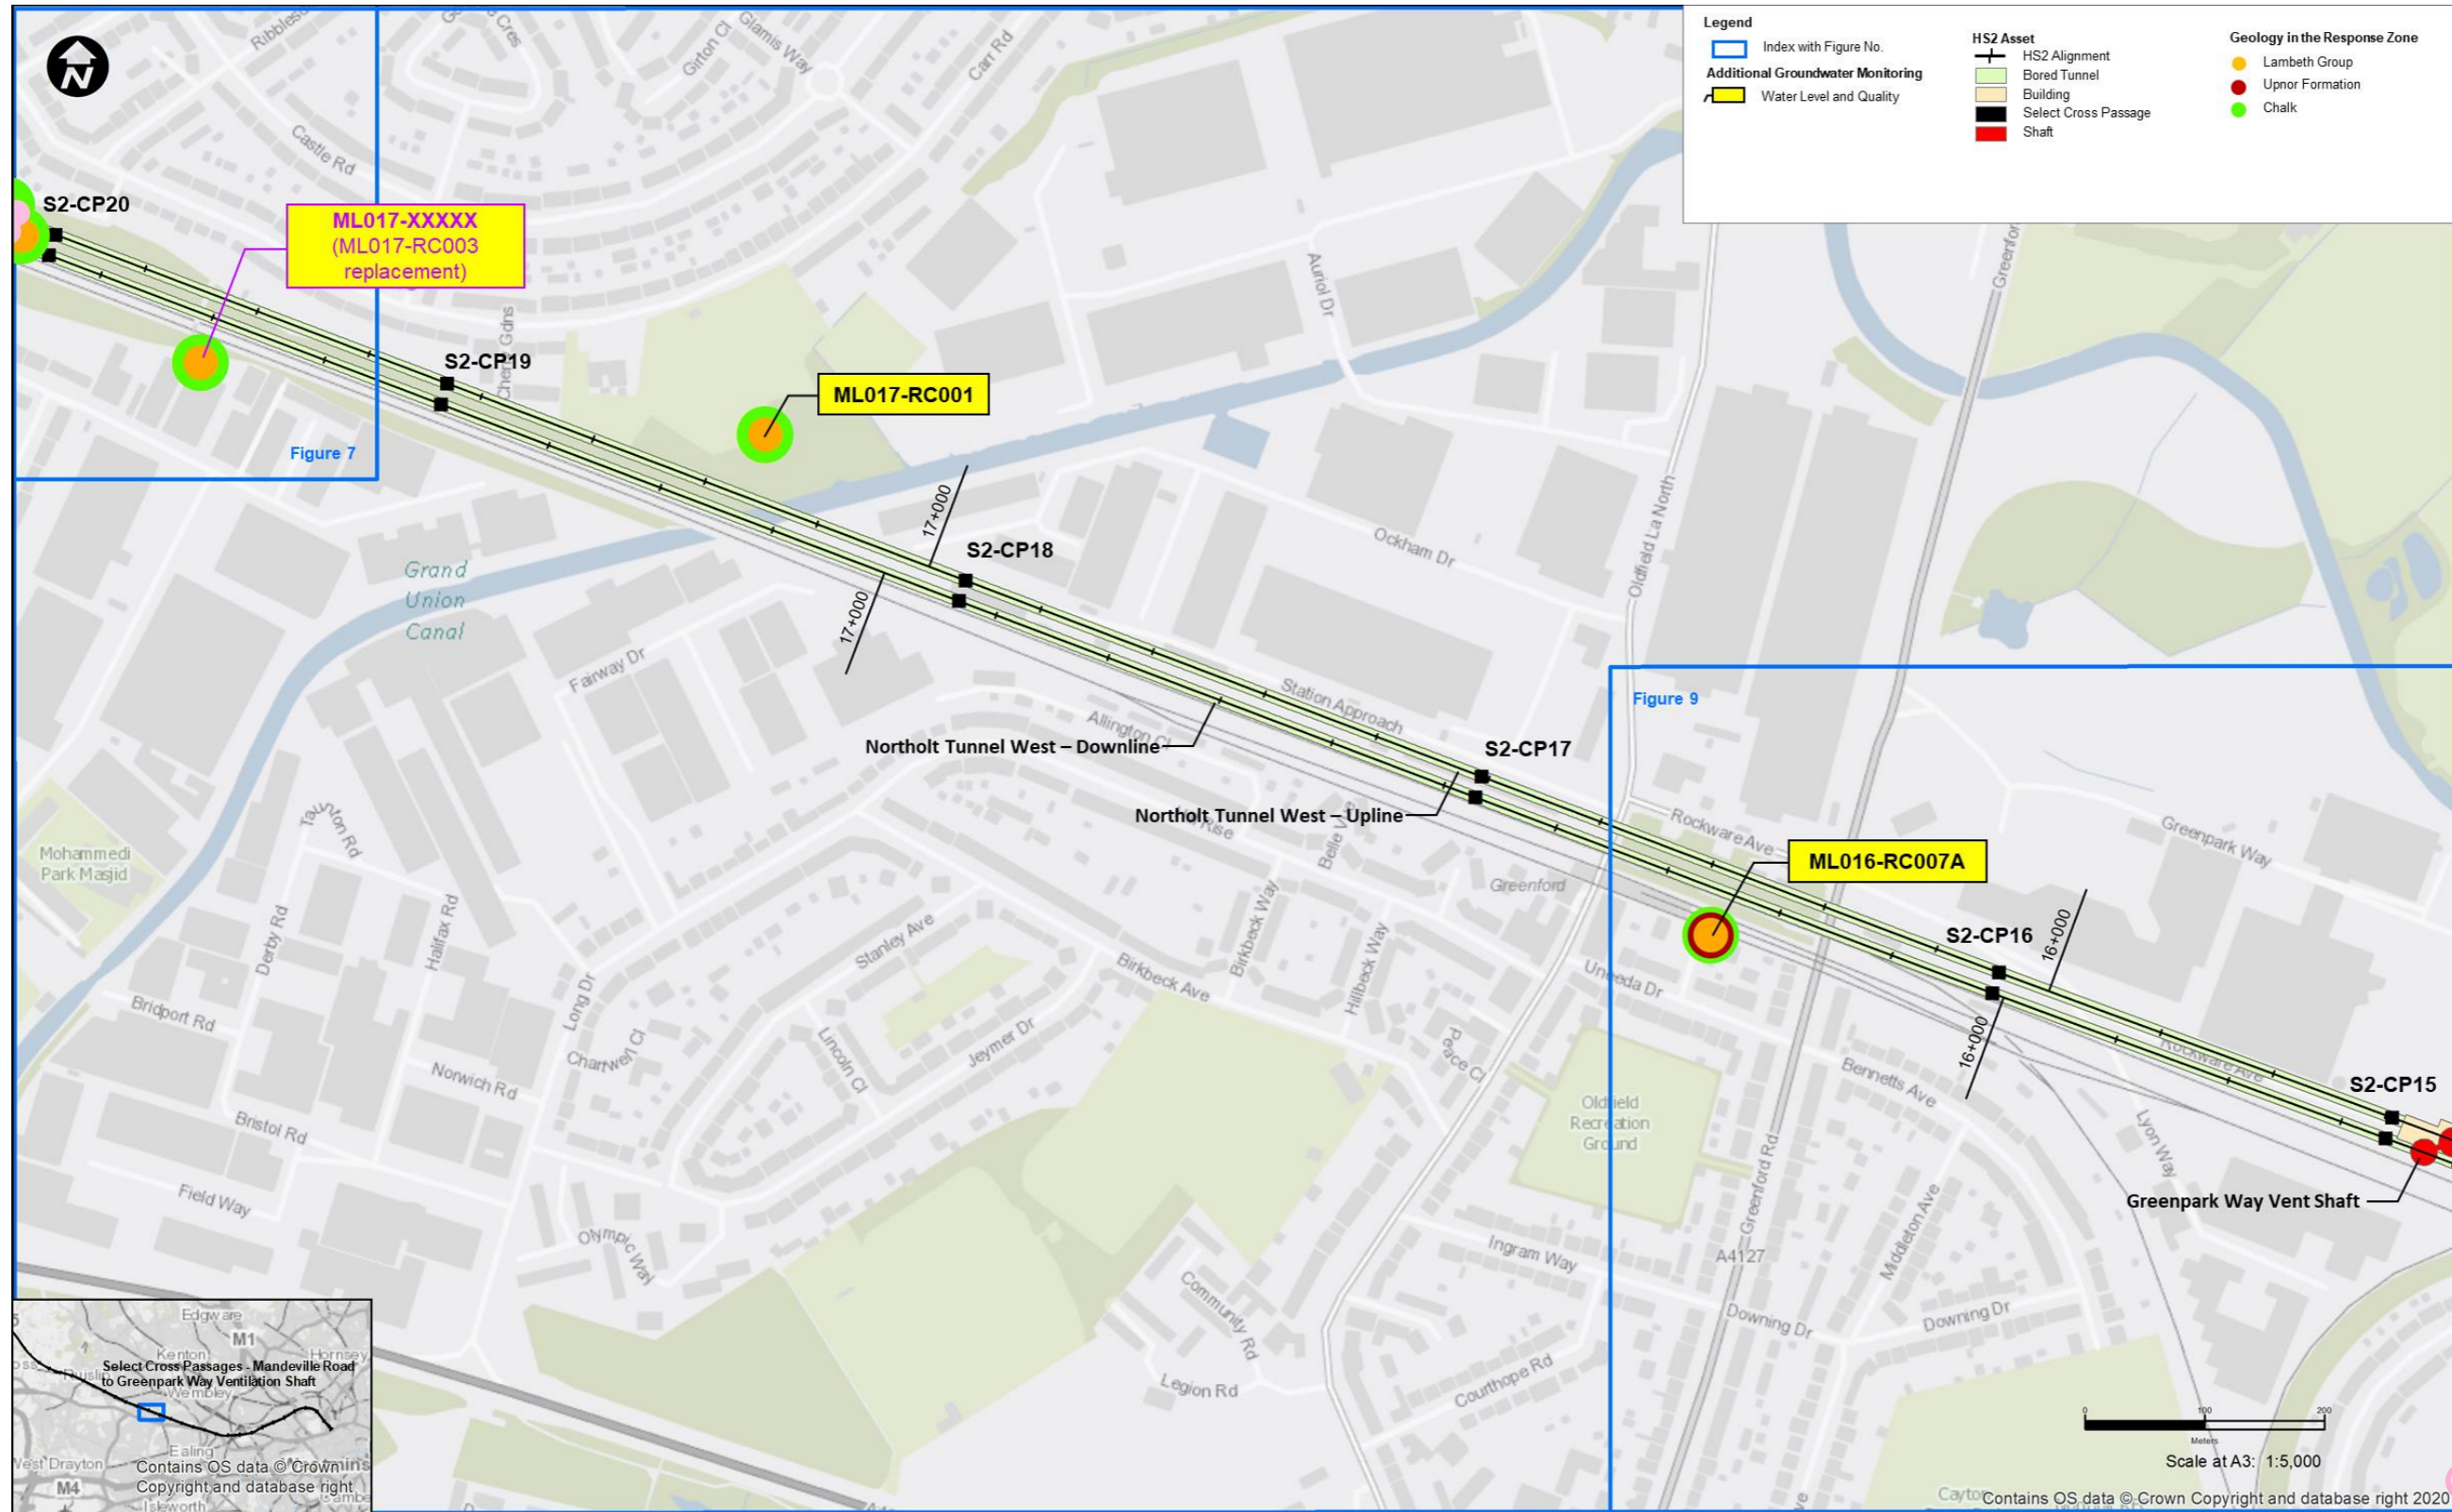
Groundwater Monitoring Plan - Cross Passages and Tunnels - Mandeville Road to Greenpark Way Ventilation Shaft
